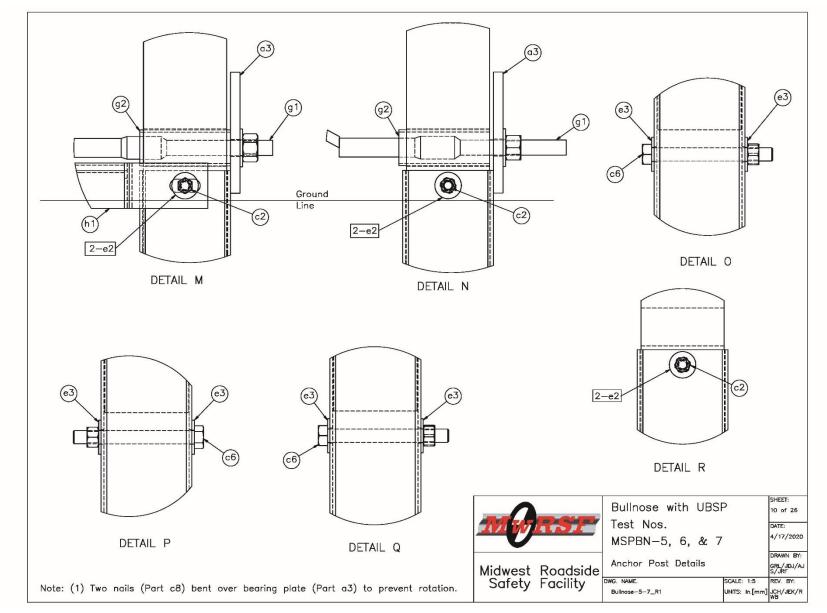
Anchor Post Details, Test Nos. MSPBN-5 through MSPBN-7
